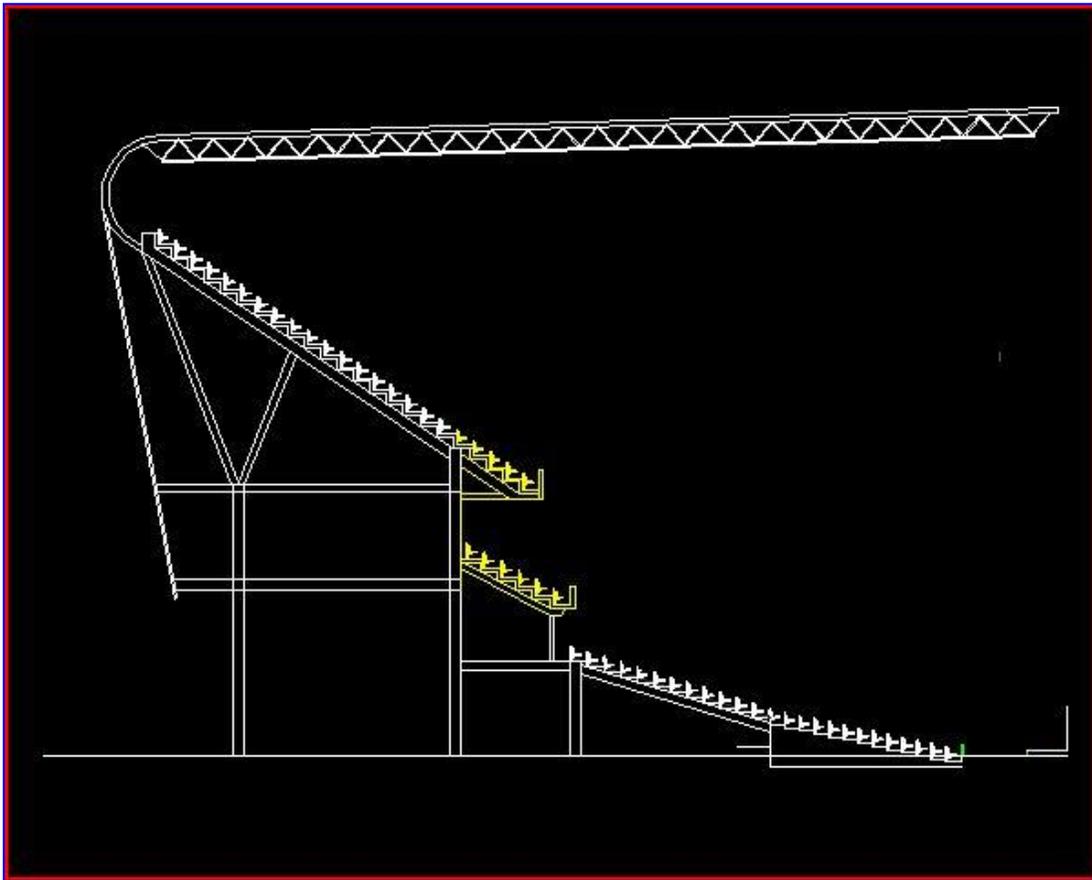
Extended upper tier. Note existing roof shown in grey (Roof Truss not shown)
